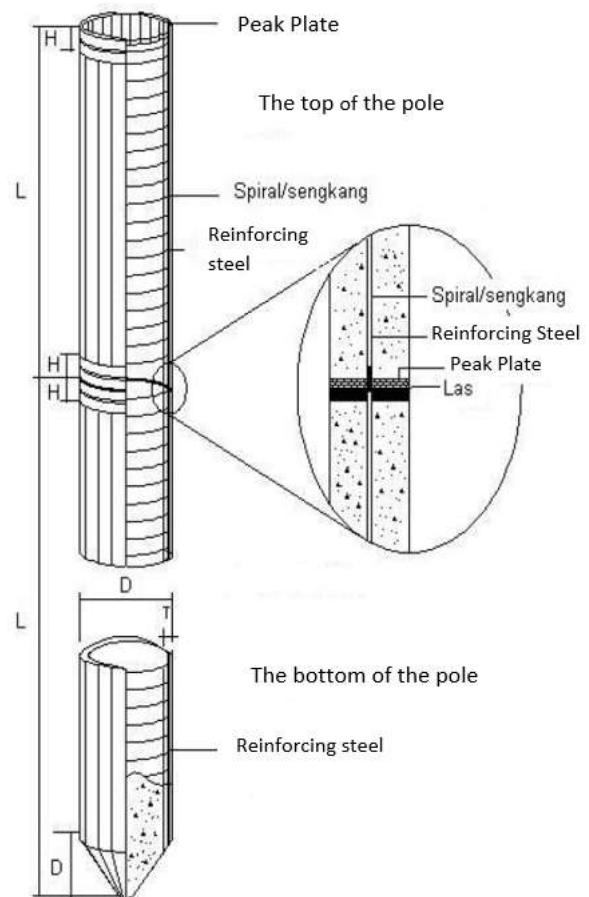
Construction of Round Pile Connections with Welding
